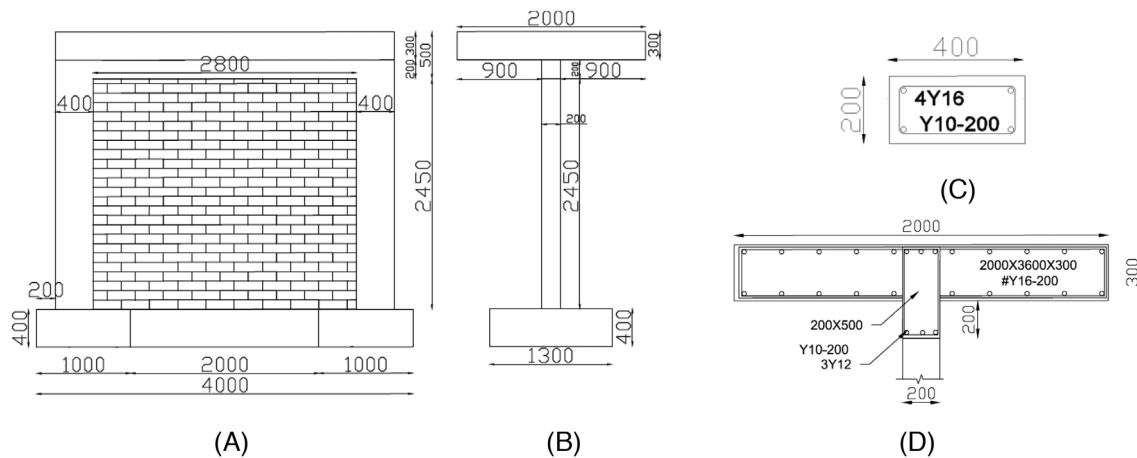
Geometry of the masonry-infilled RC frame (A) front view; and (B) side view, and reinforcement details of the (C) RC columns and of the (D) T-section RC beam (all dimensions in mm).
